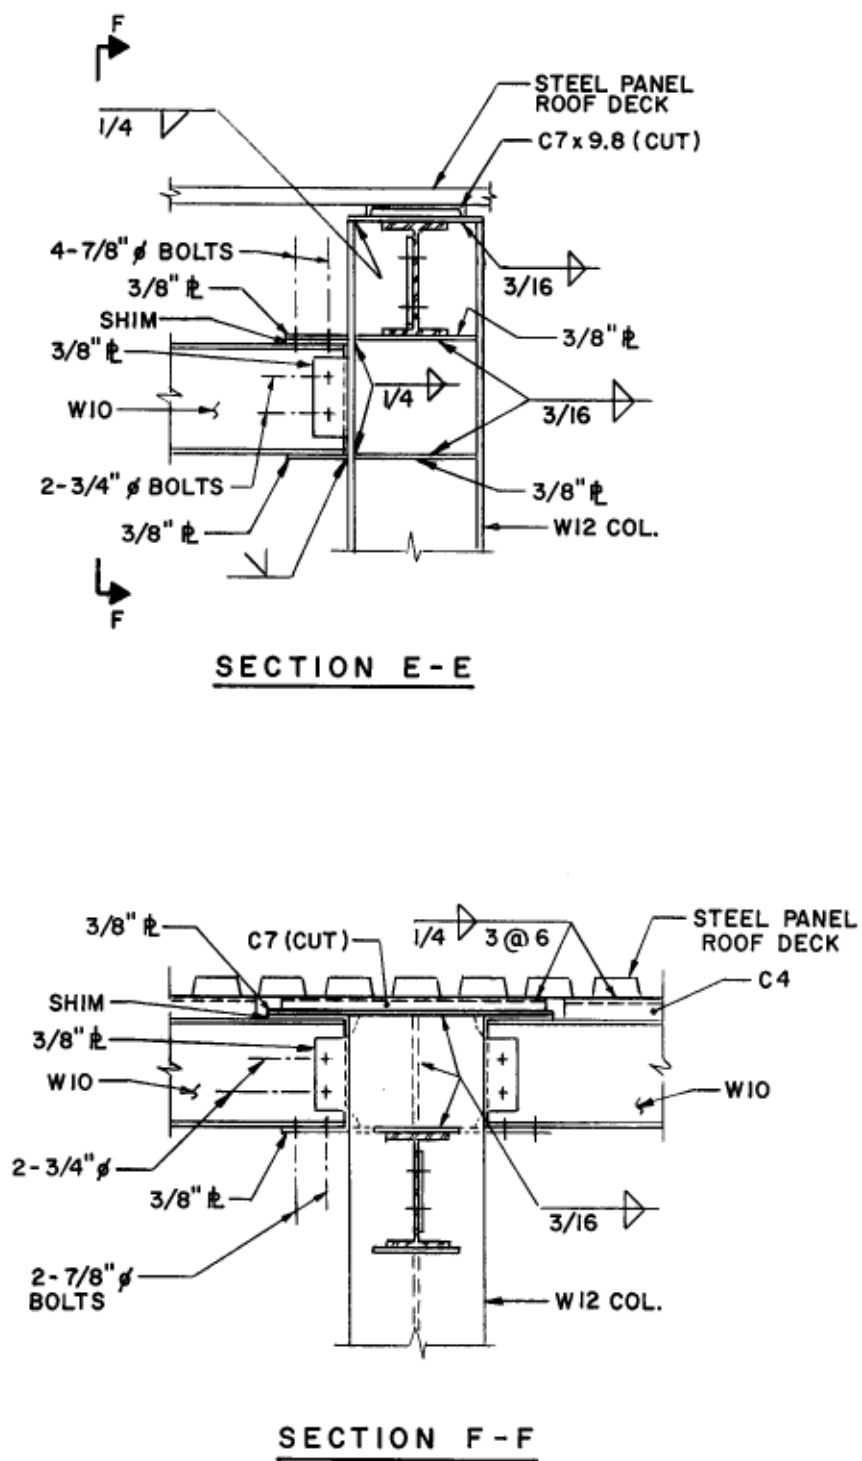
Typical Framing Detail at Corner Column 1-D
